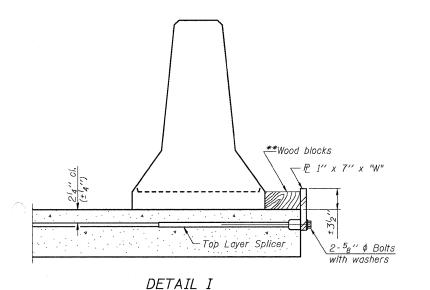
Detail I - With Bar Splicer or Couplers: Connect one (1) 1"x7"x10" steel P to the top layer of couplers with $2^{-5}8'' \phi$ bolts screwed to coupler at approximate ℓ of each barrier panel.
